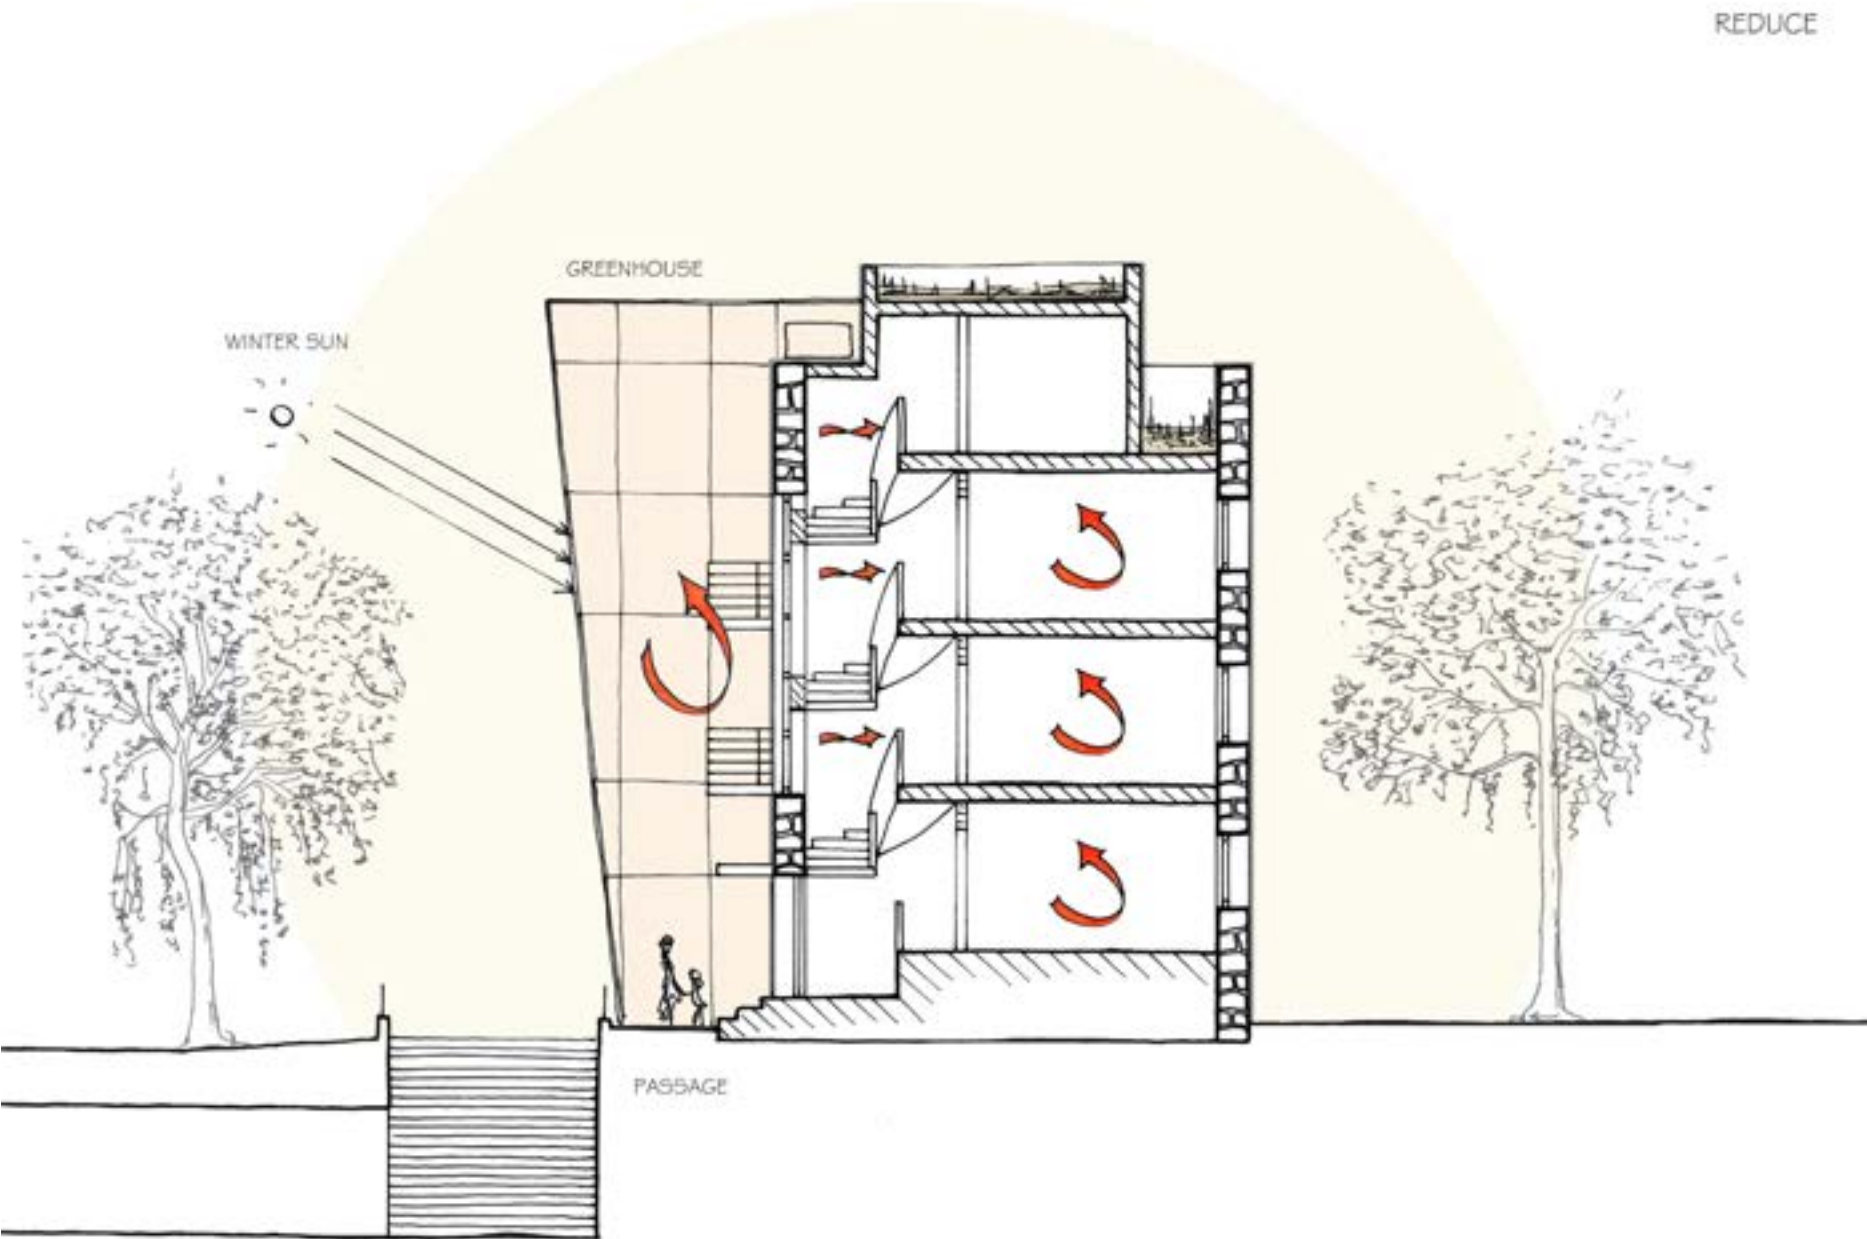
Author (2022). Section of the first building of Prosfygika - Reduce (greenhouse, winter) [Sketch].
